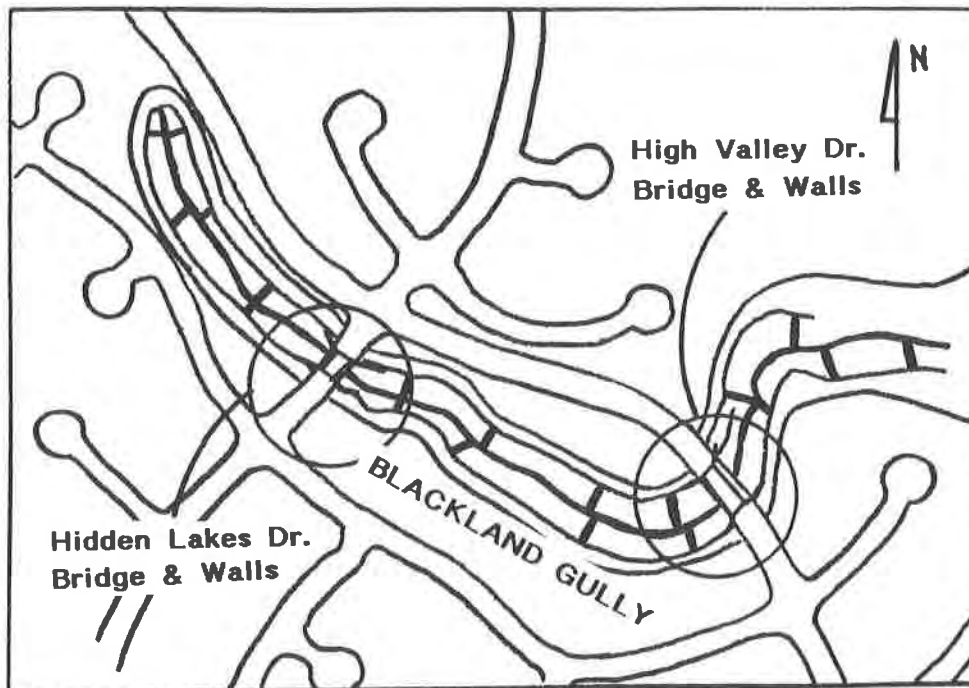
Site Plan View - Blackland Gully Channel Crossings
